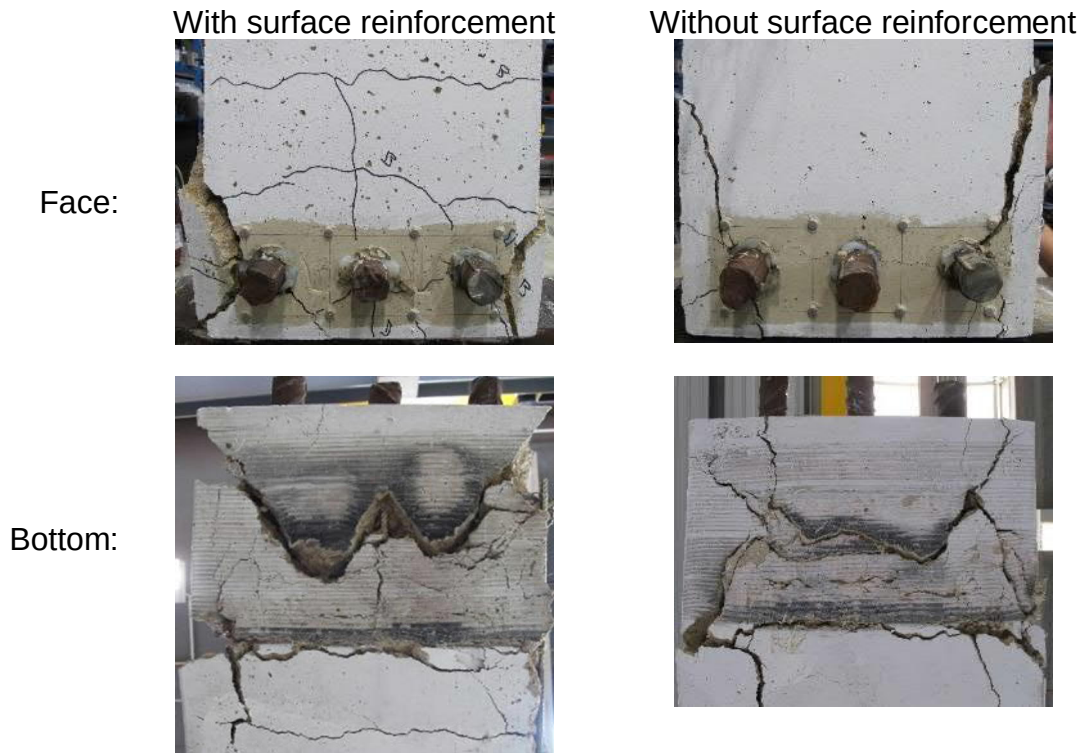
Crack patterns in test V6-2 at the front and bottom sides with surface reinforcement (left) and test V6-1 without surface reinforcement (right)
